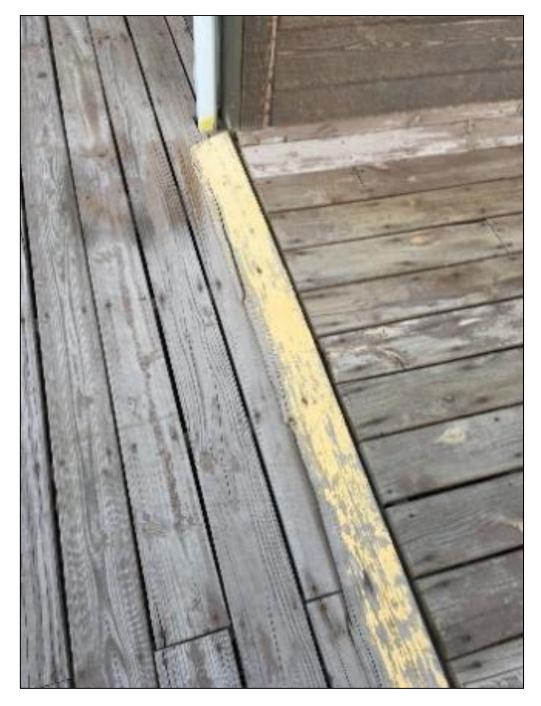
Fox Hills Clubhouse - Elevation Difference Between South and East Deck
